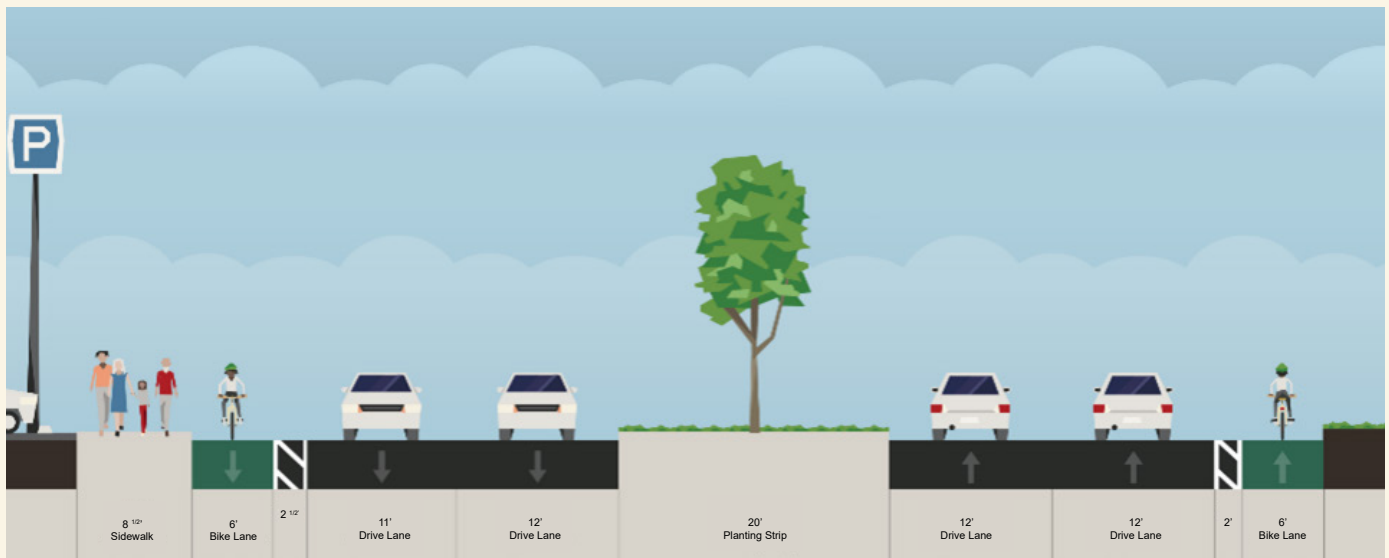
Proposed cross-section and overhead view for Via Verde west of Puente (Class II) - looking east
